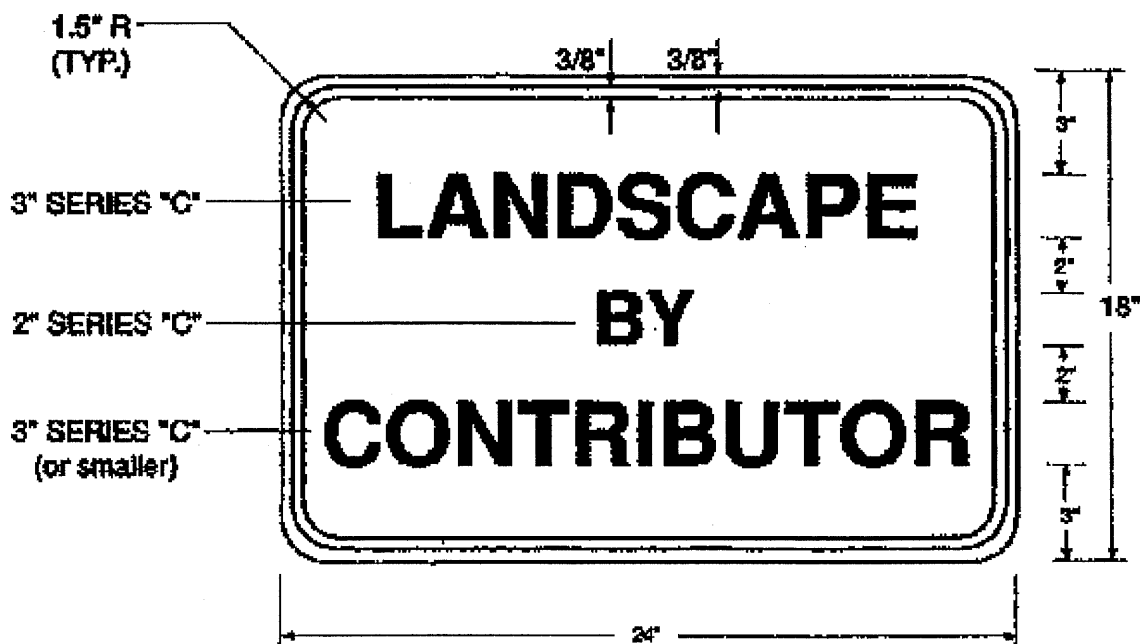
Arterial and Limited Access Landscape Roadway Sign
